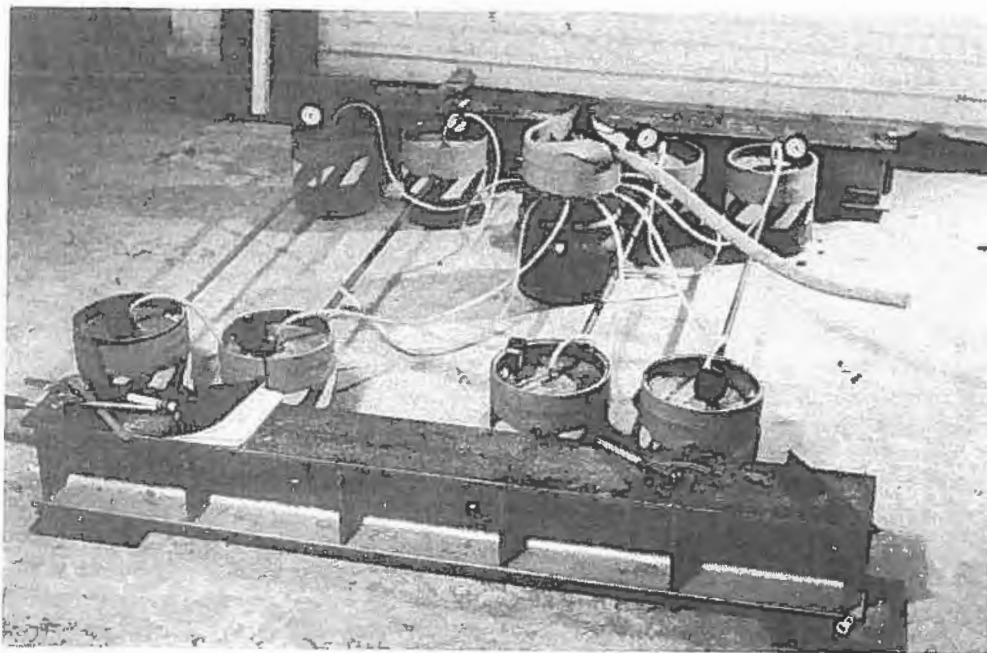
Arrangement of vacuum treated moulds with reinforcement which is moved by bending.
